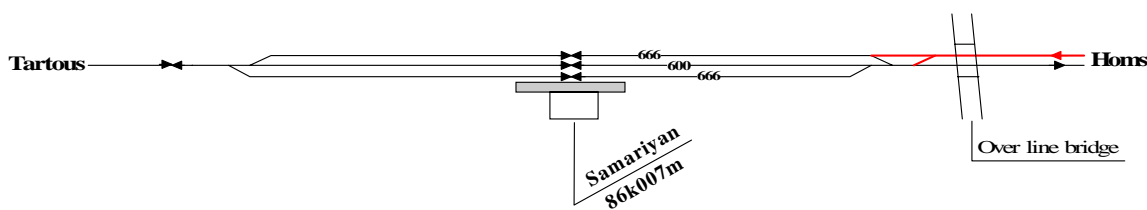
Station Yard Track Layout of Samariyan Station
